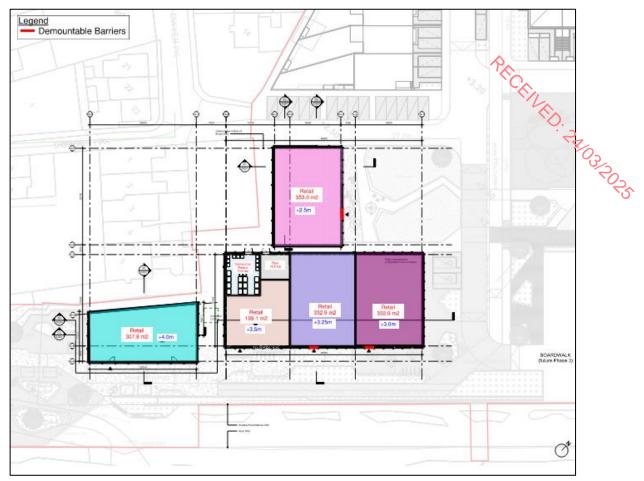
Detailed architectural drawing of Block G levels and location of demountable barriers
